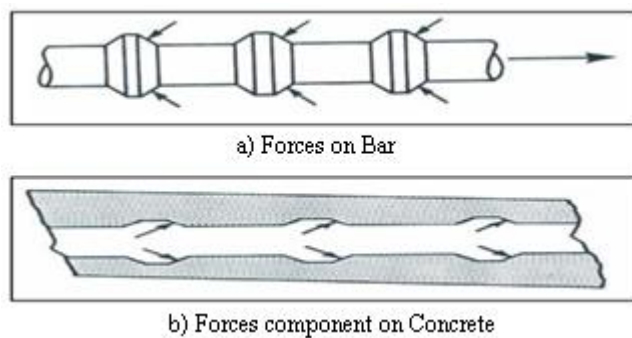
Bond between Reinforcing Steel-Bar and Concrete.
